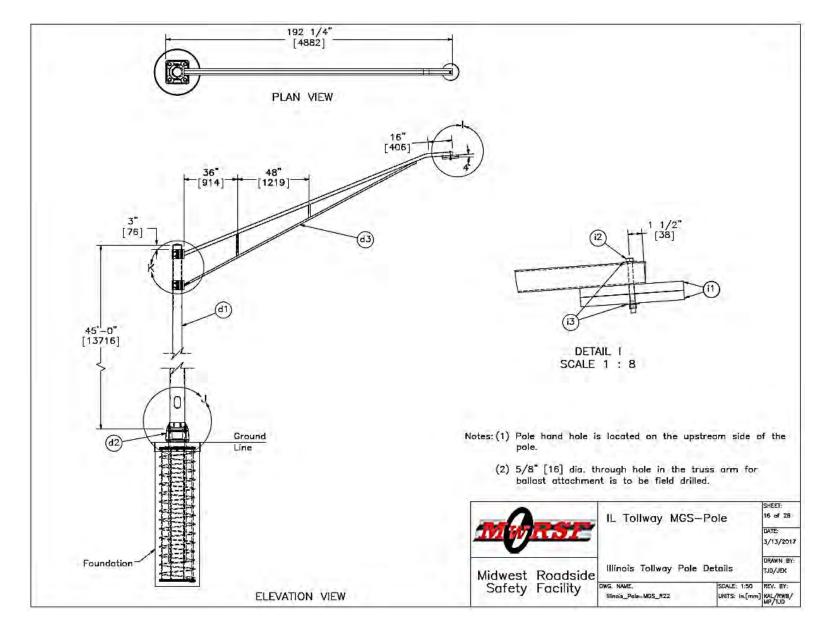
Illinois Tollway Pole Details, Test No. ILT-1
